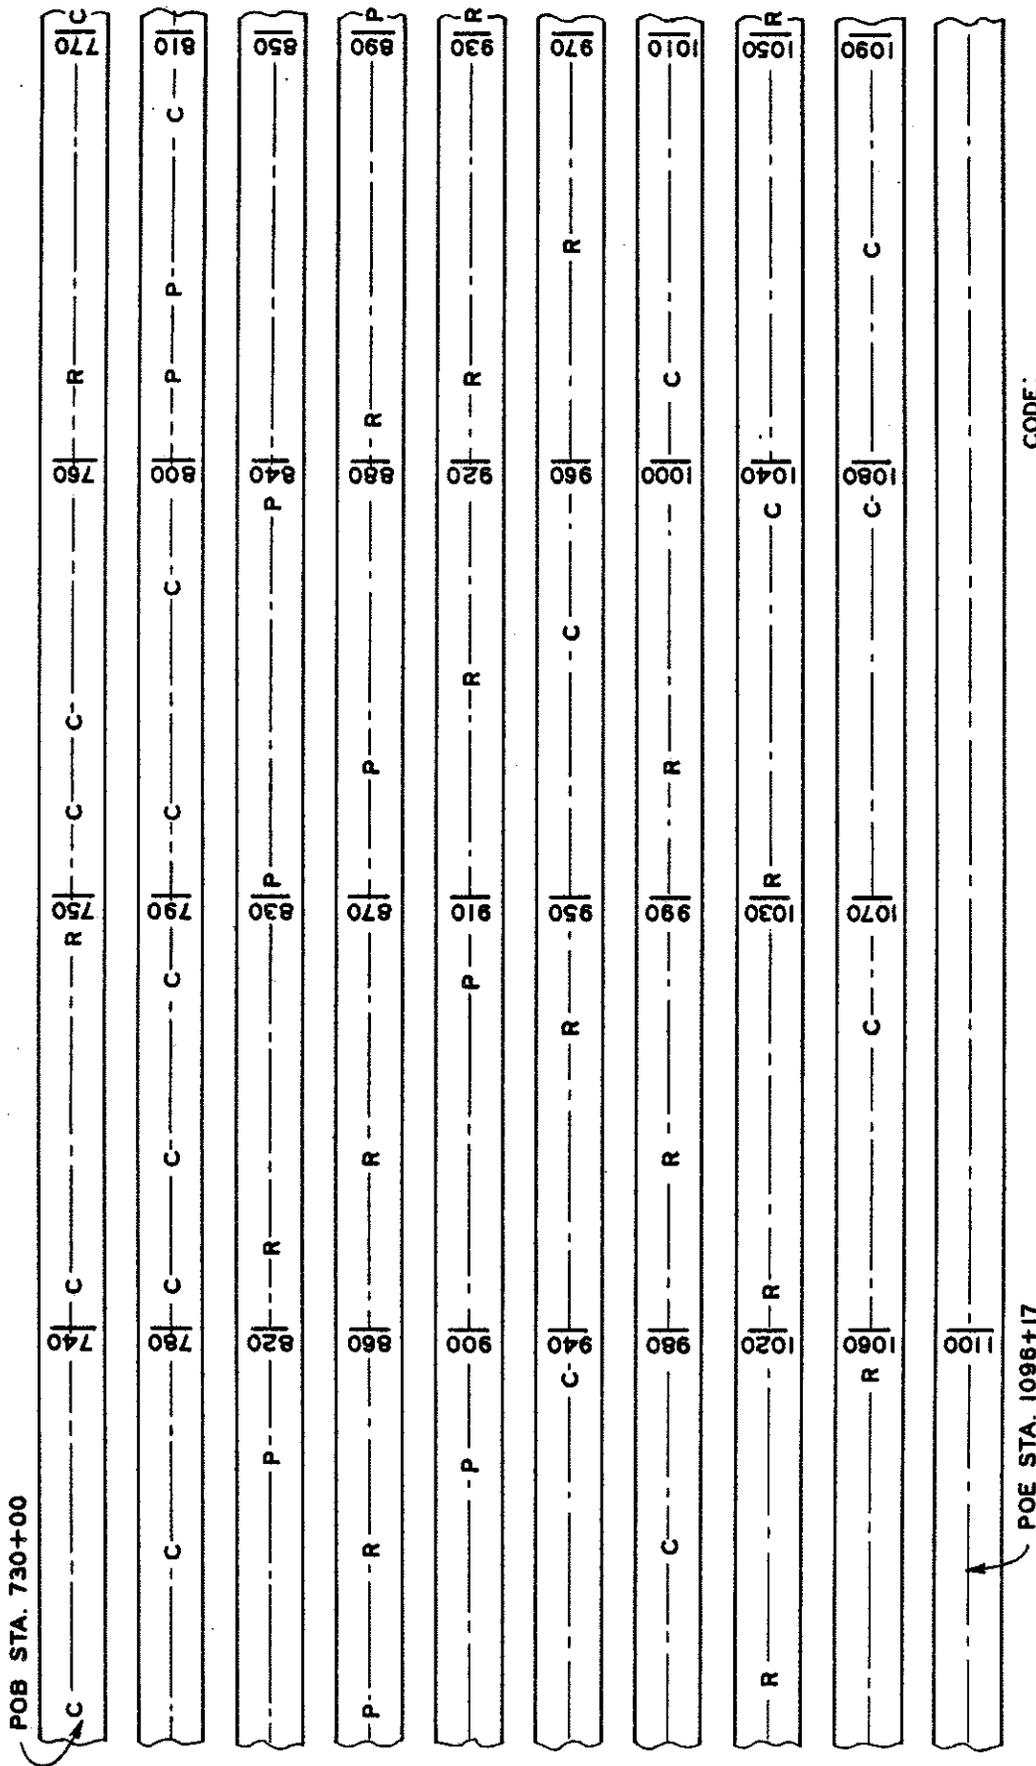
Layout of preventive joint repair pavement section, (southbound roadway).
